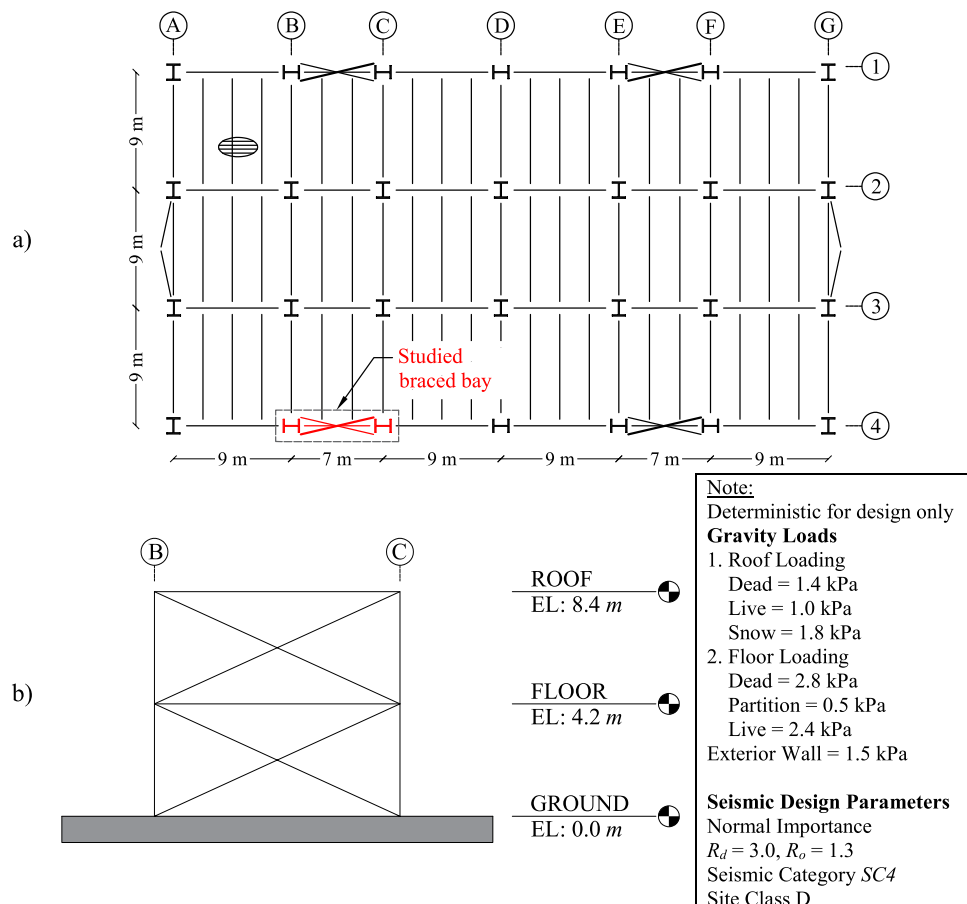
(a) Typical plan view of all buildings; (b) elevation view of the 2-story buildings.
